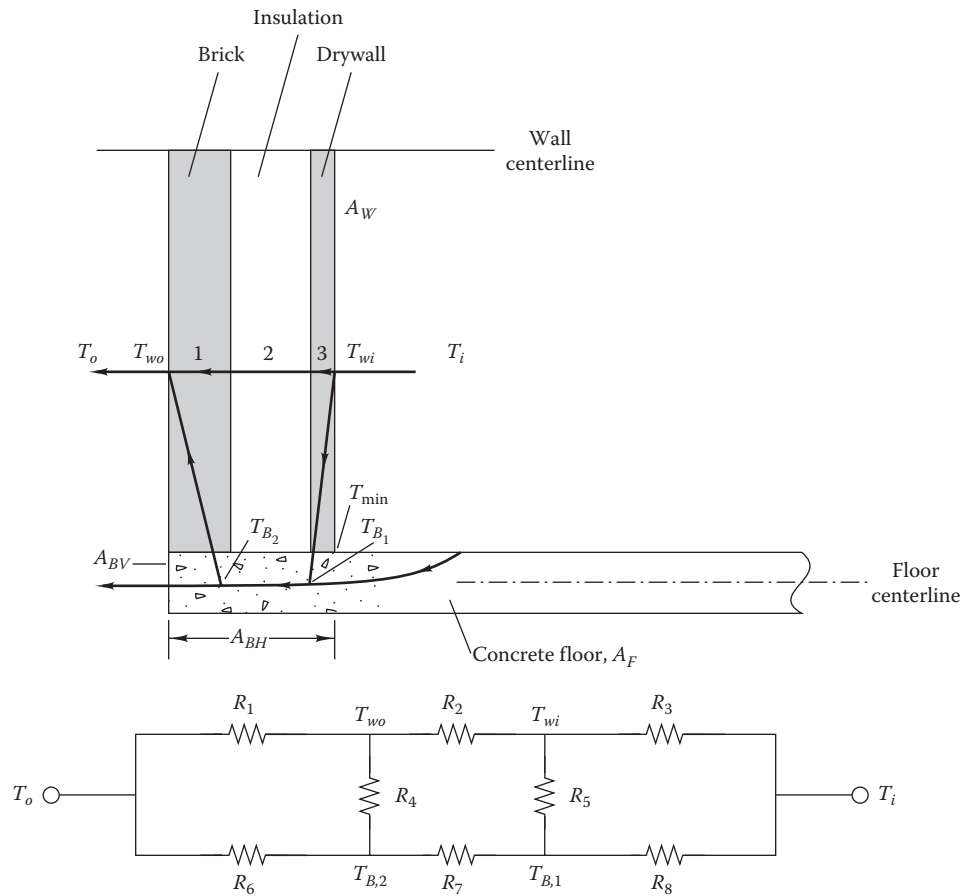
Example of a thermal bridge (concrete floor) with insulated wall above. The thermal network allows for 2-D calculations of the thermal bridge heat loss. Heavy lines with arrows show various heat flow paths. Each resistance can be found by using basic equations developed earlier for conduction and convection. Resistances R_1 , R_6 , R_3 , and R_8 include surface film effects.
